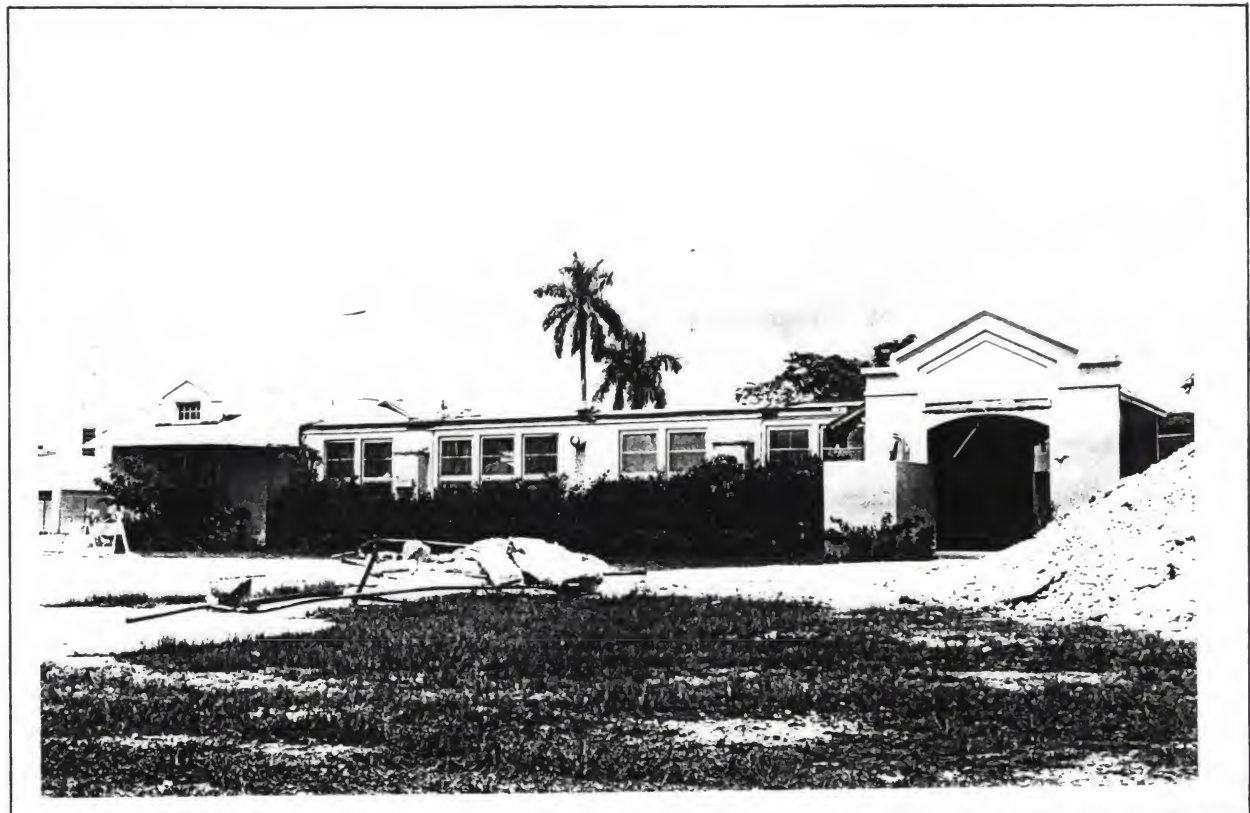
REDLAND ELEMENTARY SCHOOL, WEST ELEVATION, LEFT.
